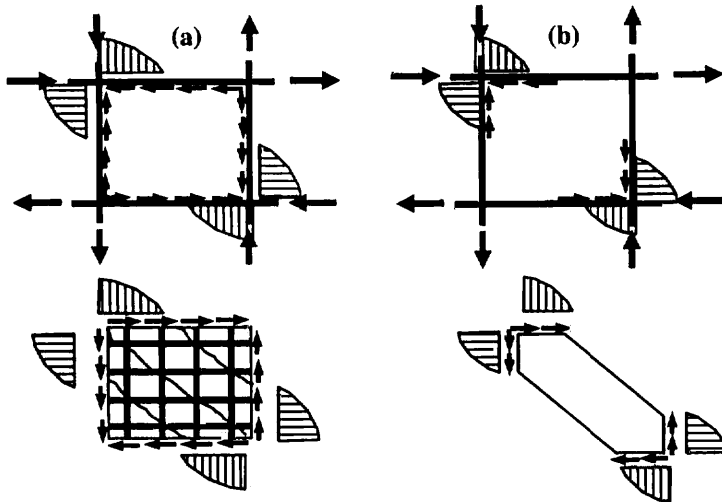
Interior joint: (a) well detailed joint, prior to loss of bond of primary reinforcement. (b) single strut action after loss of bond.
